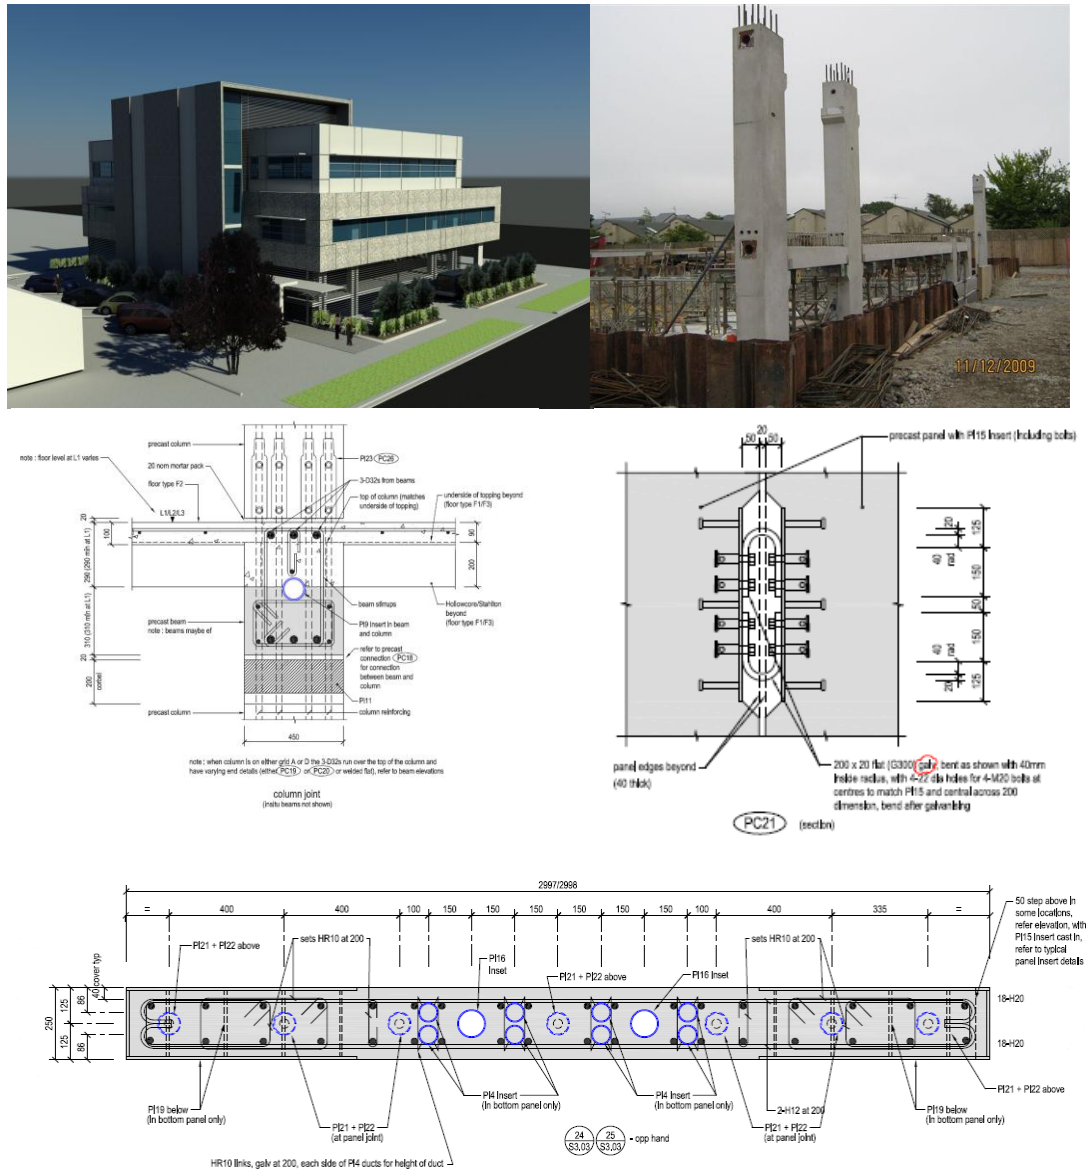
Southern Cross Hospital, Christchurch Rendering, construction of the frame, details of beams, walls and UFP dissipaters (Structural Engineers: Structex; Pampanin et al., 2011).
